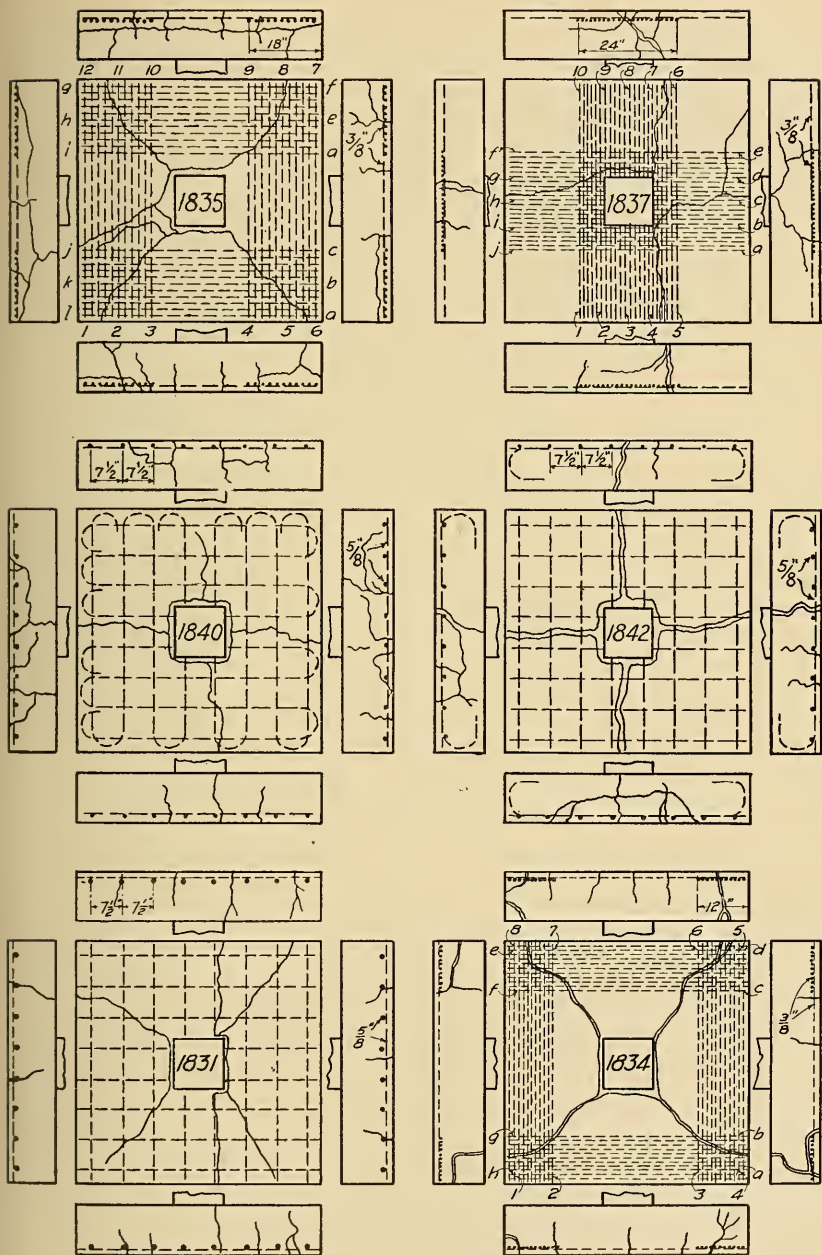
REINFORCED CONCRETE COLUMN FOOTINGS.
